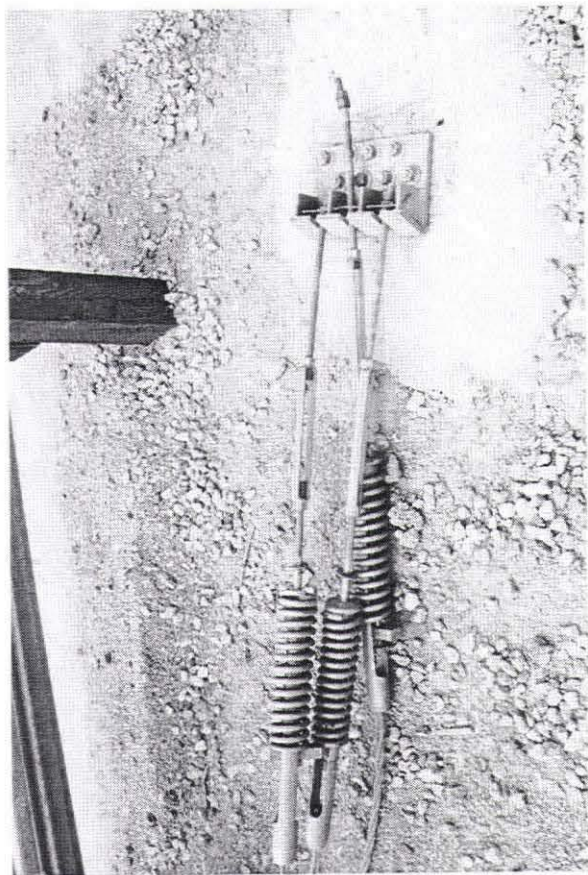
Downstream Cable Anchorage Damage, Test SDC-1
